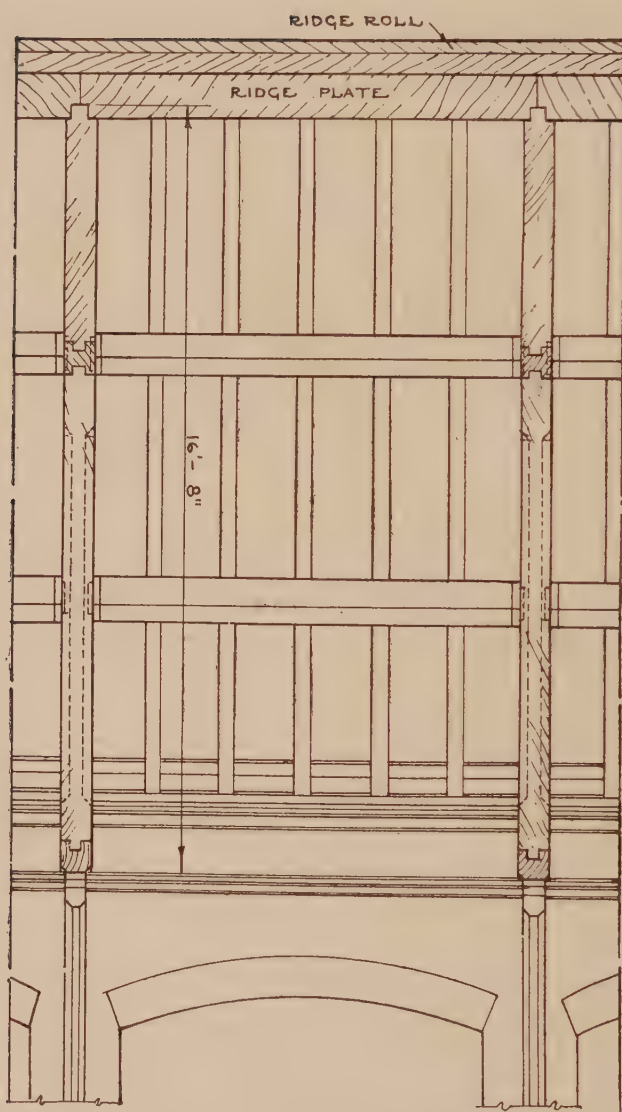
Interior elevation of one bay of church roof (see Fig. 131).
